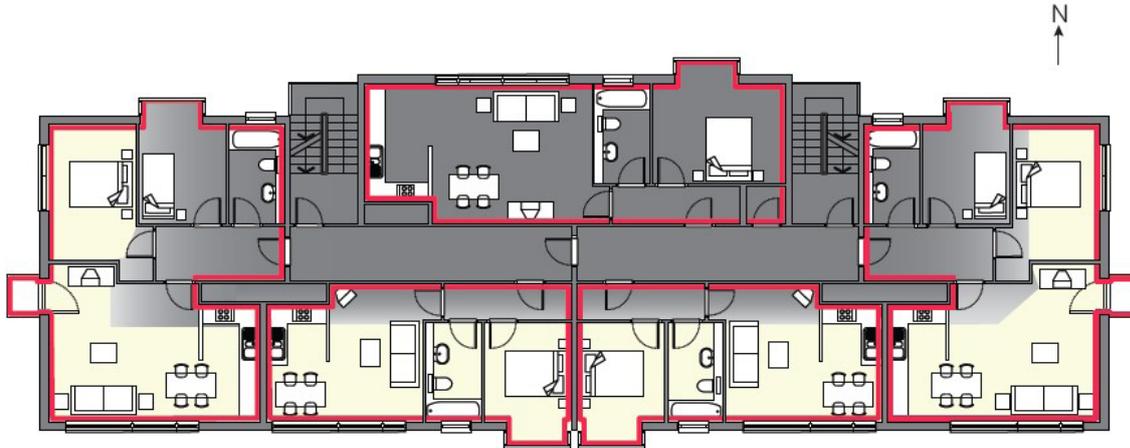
Careful layout design means that four out of the five flats shown have a south-facing living room
